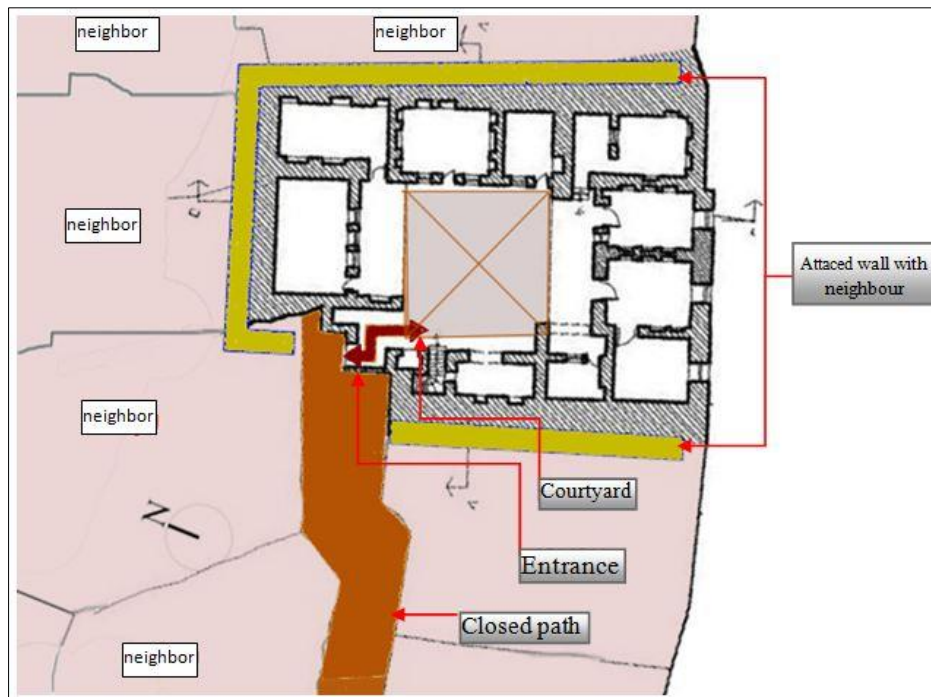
House plan showing the entrance's shape and ground floor house plan, details by author
